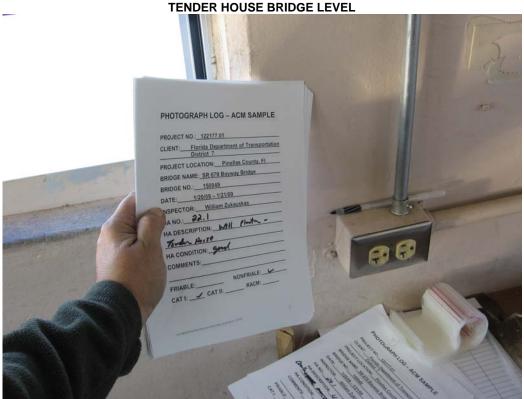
01/21/09 – SAMPLE 22.1 – HA 22 PLASTER TENDER HOUSE INTERIOR WALLS AND CEILINGS
